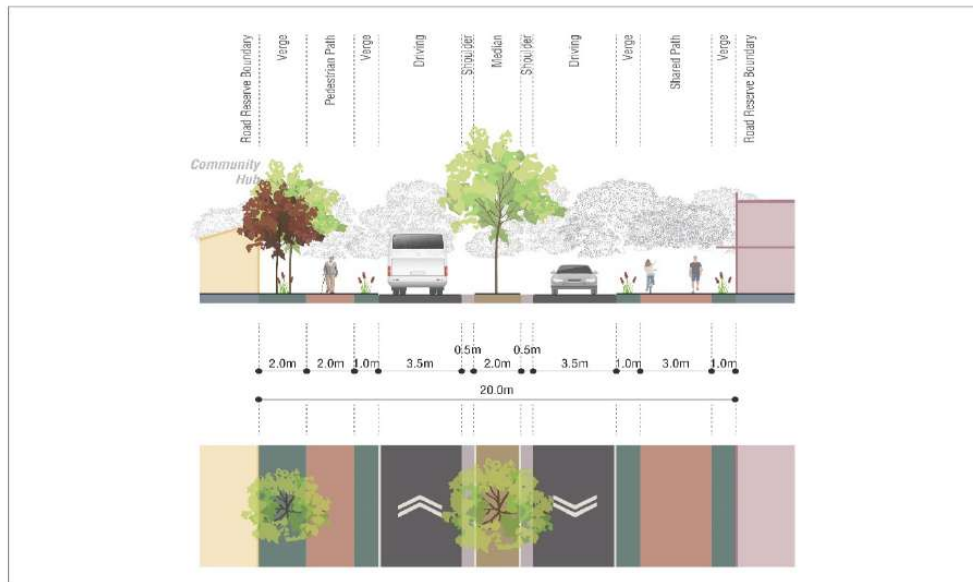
RD09 Milner Road (Berkshire Road to Sultana Road West) and RD10 Milner Road (Stewart Road to Maida Vale Road) Cross Section
